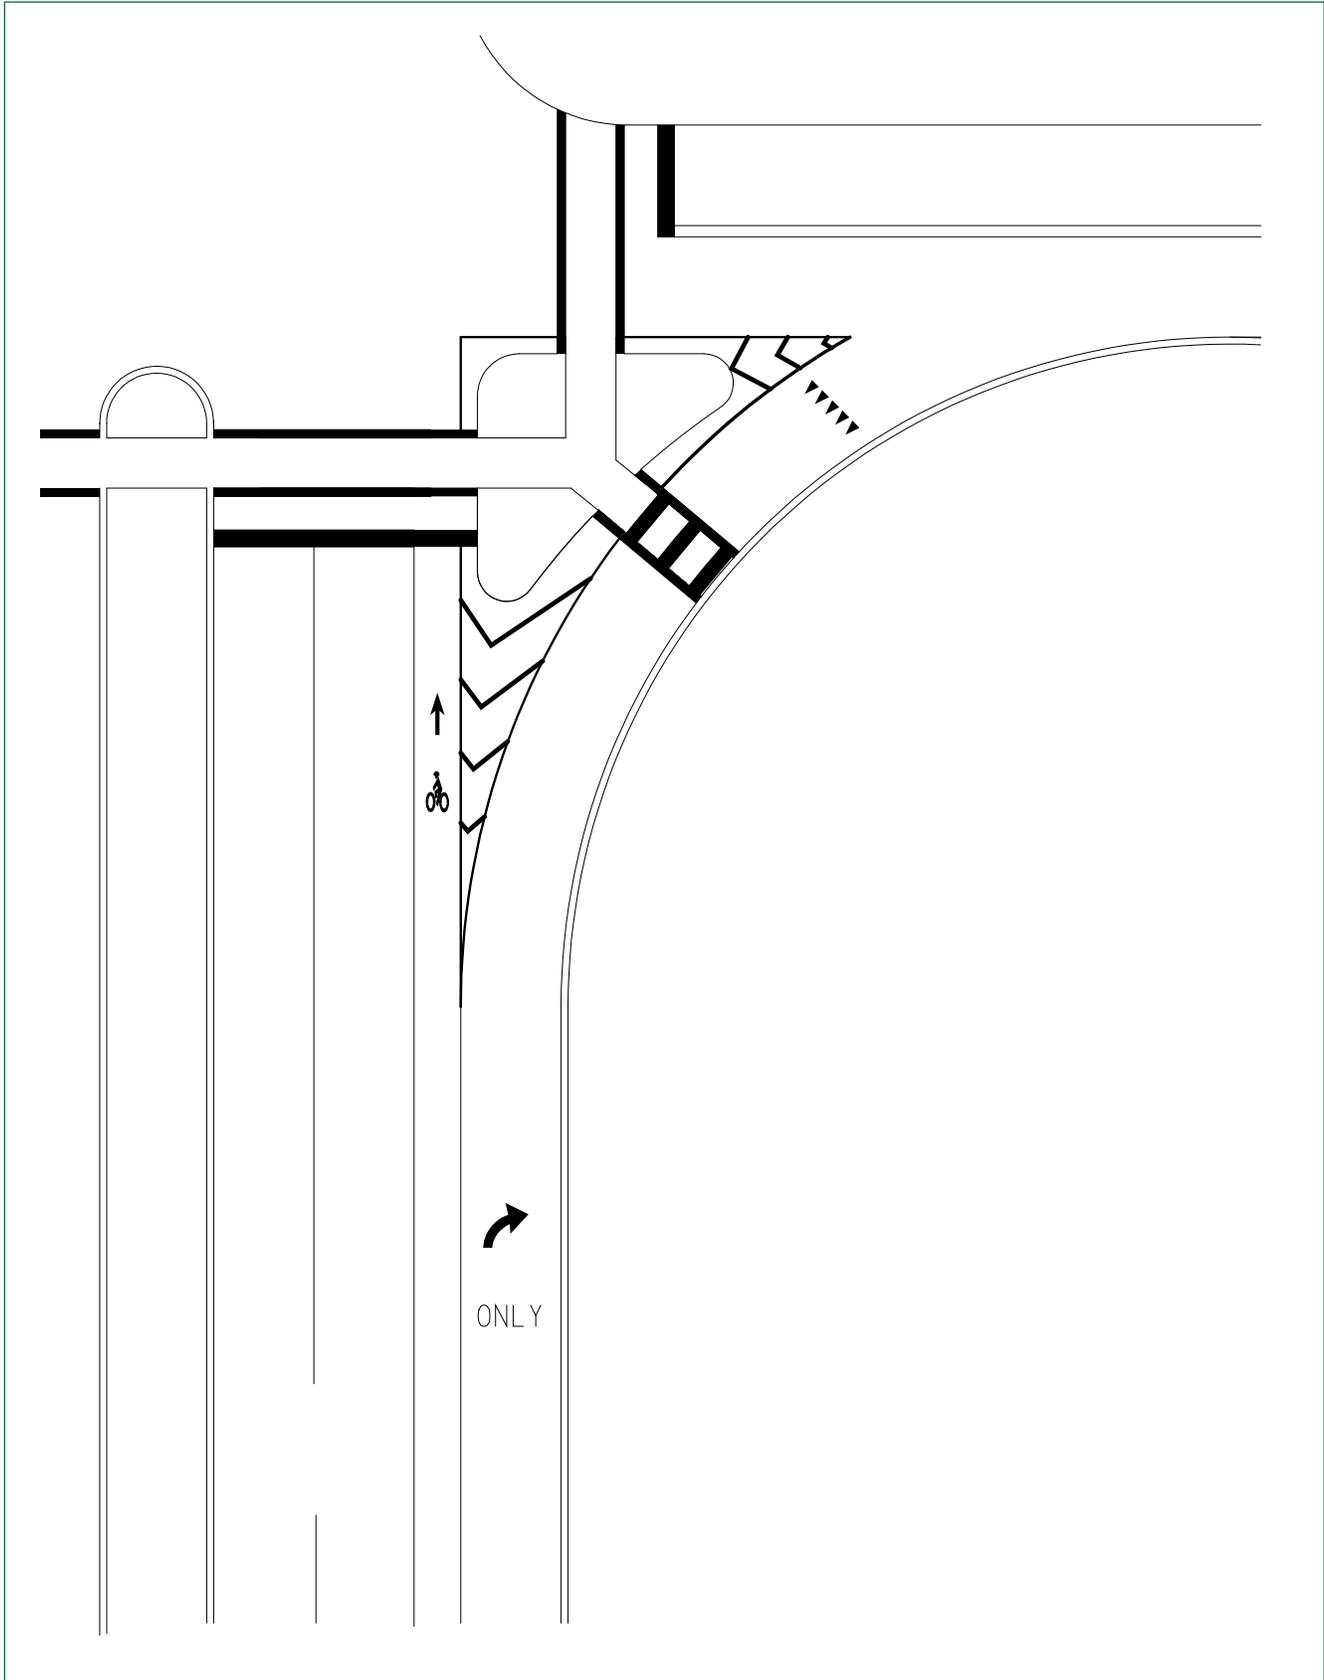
Details of Corner Island for Turning Roadways (Curbed)
